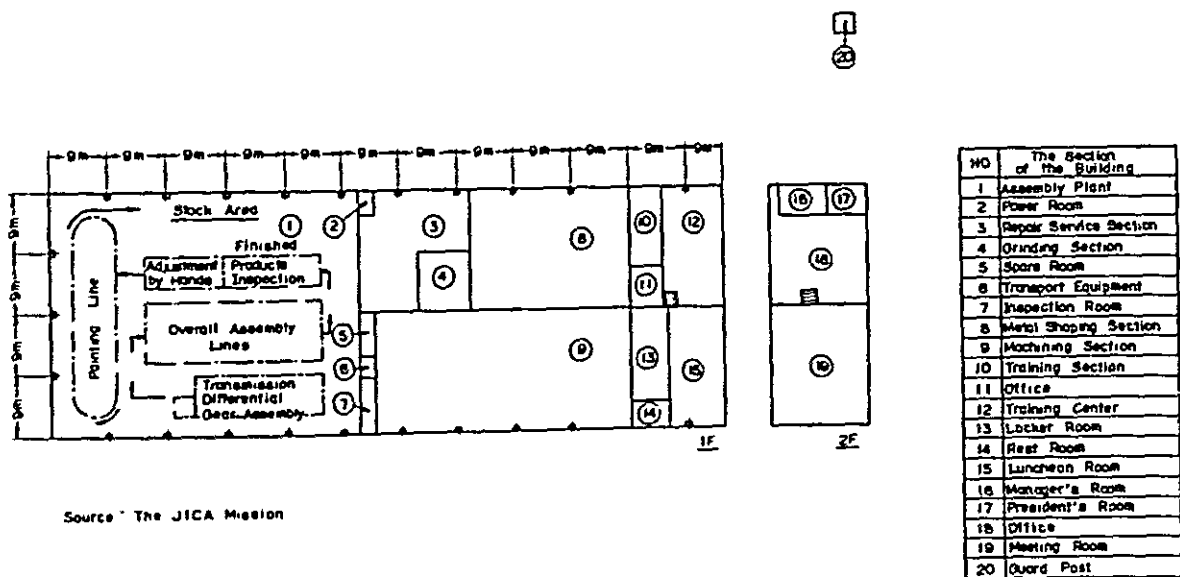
A Tractor Assembly Plant Layout for the Second Case
